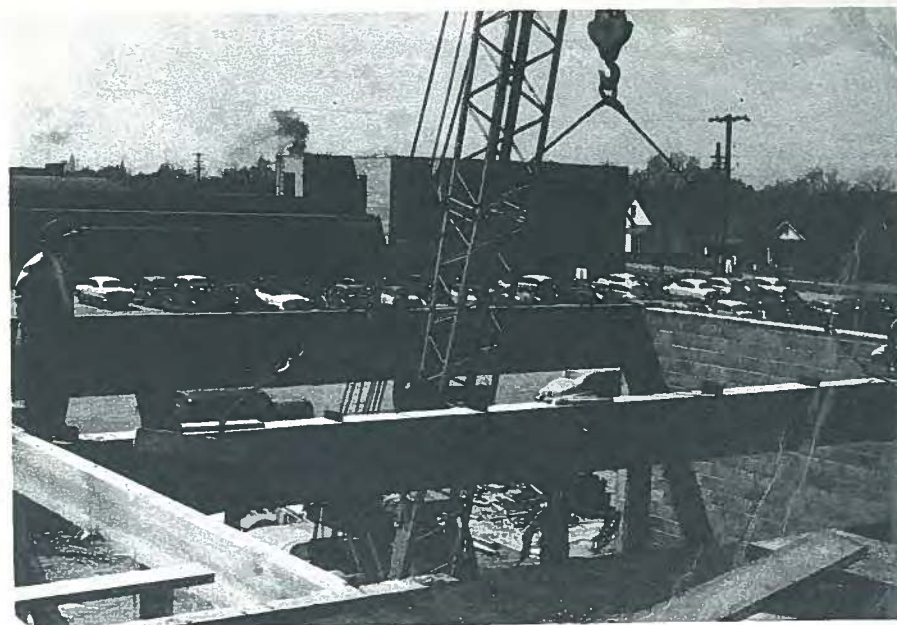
The largest prestressed beam in Colorado made by Prestressed Concrete of Colorado was for the Plat Packing Plant in 1952.
